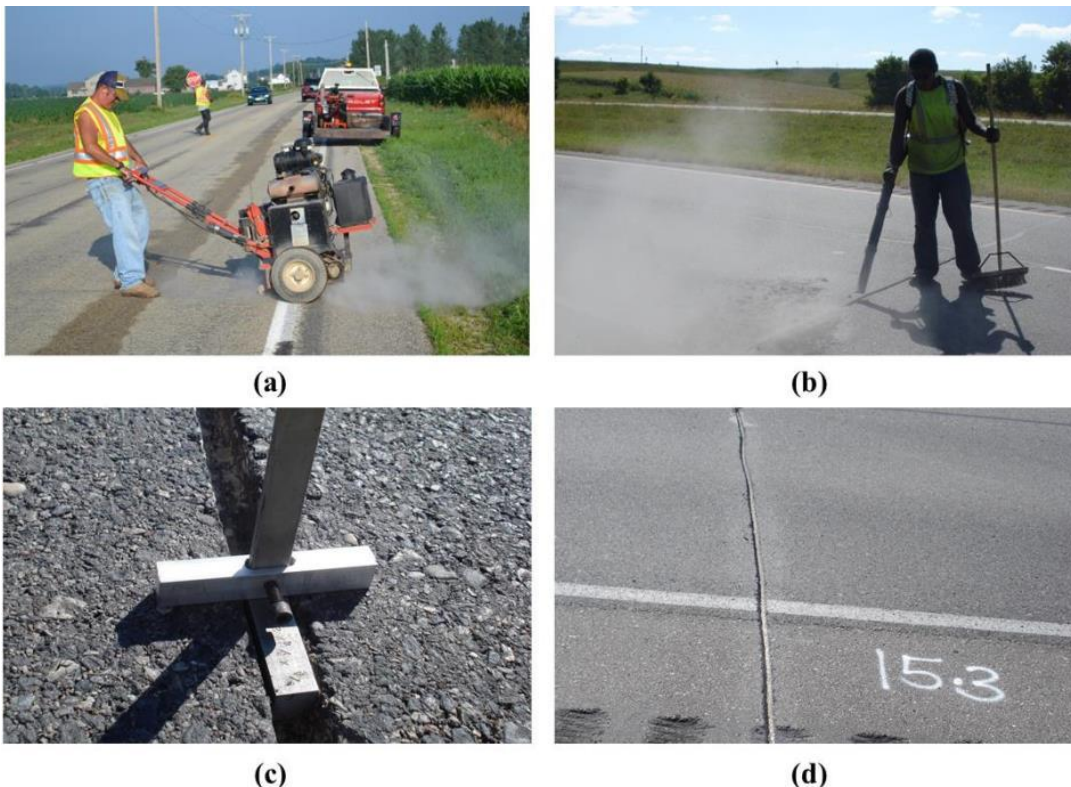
Typical operations prior to crack sealing: (a) routing; (b) pavement and crack cleaning; (c) route size checking; and (d) a properly finished rout and clean pavement surface.
